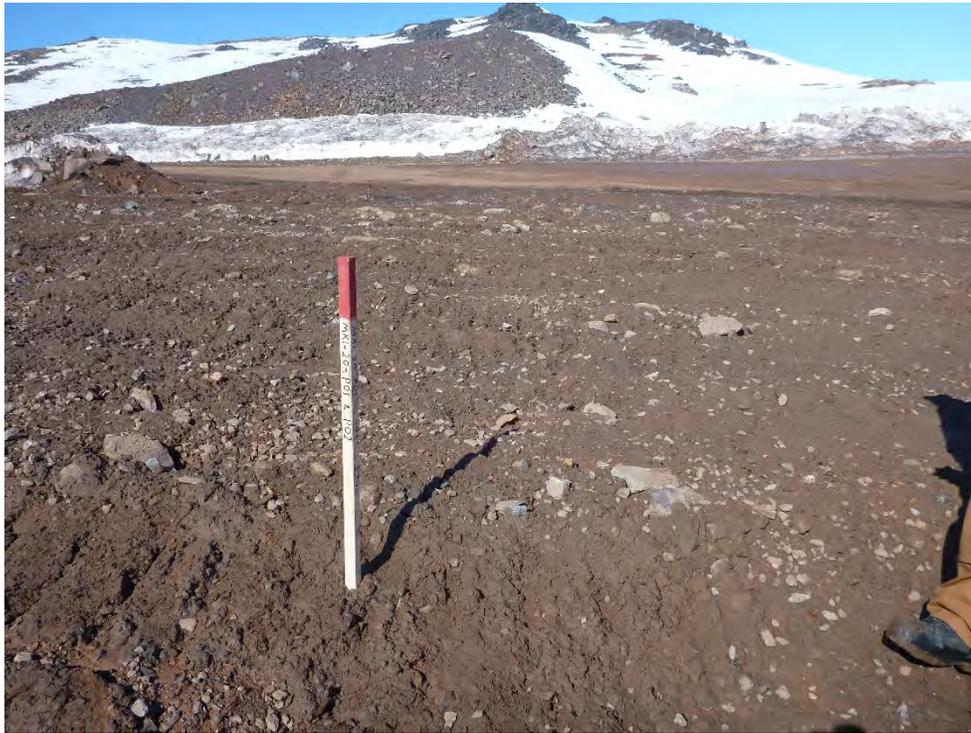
Pre-Drilling Conditions at MR1-20-270, June 13th 2020
